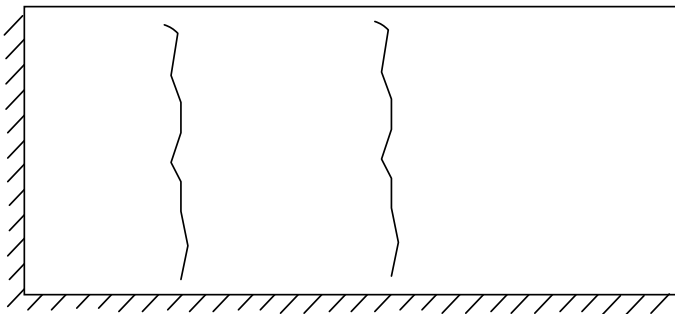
Observed cracks at a 1.2 m thick, 8.35 m high and 17.5 m long wall of Case 1.
